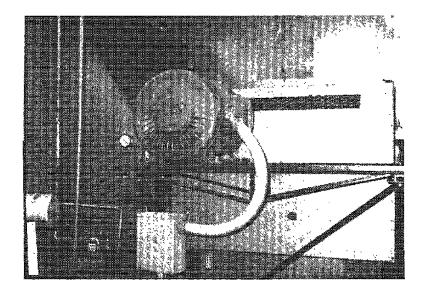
At a manufacturing facility, affected by the 1989 Loma Prieta Earthquake, a fan motor, mounted external to the air handler, sheared its anchor bolts. The cause appears to be differential flexure between the fan impeller (connected to the motor through the drive shaft) and the steel frame supporting the motor.
